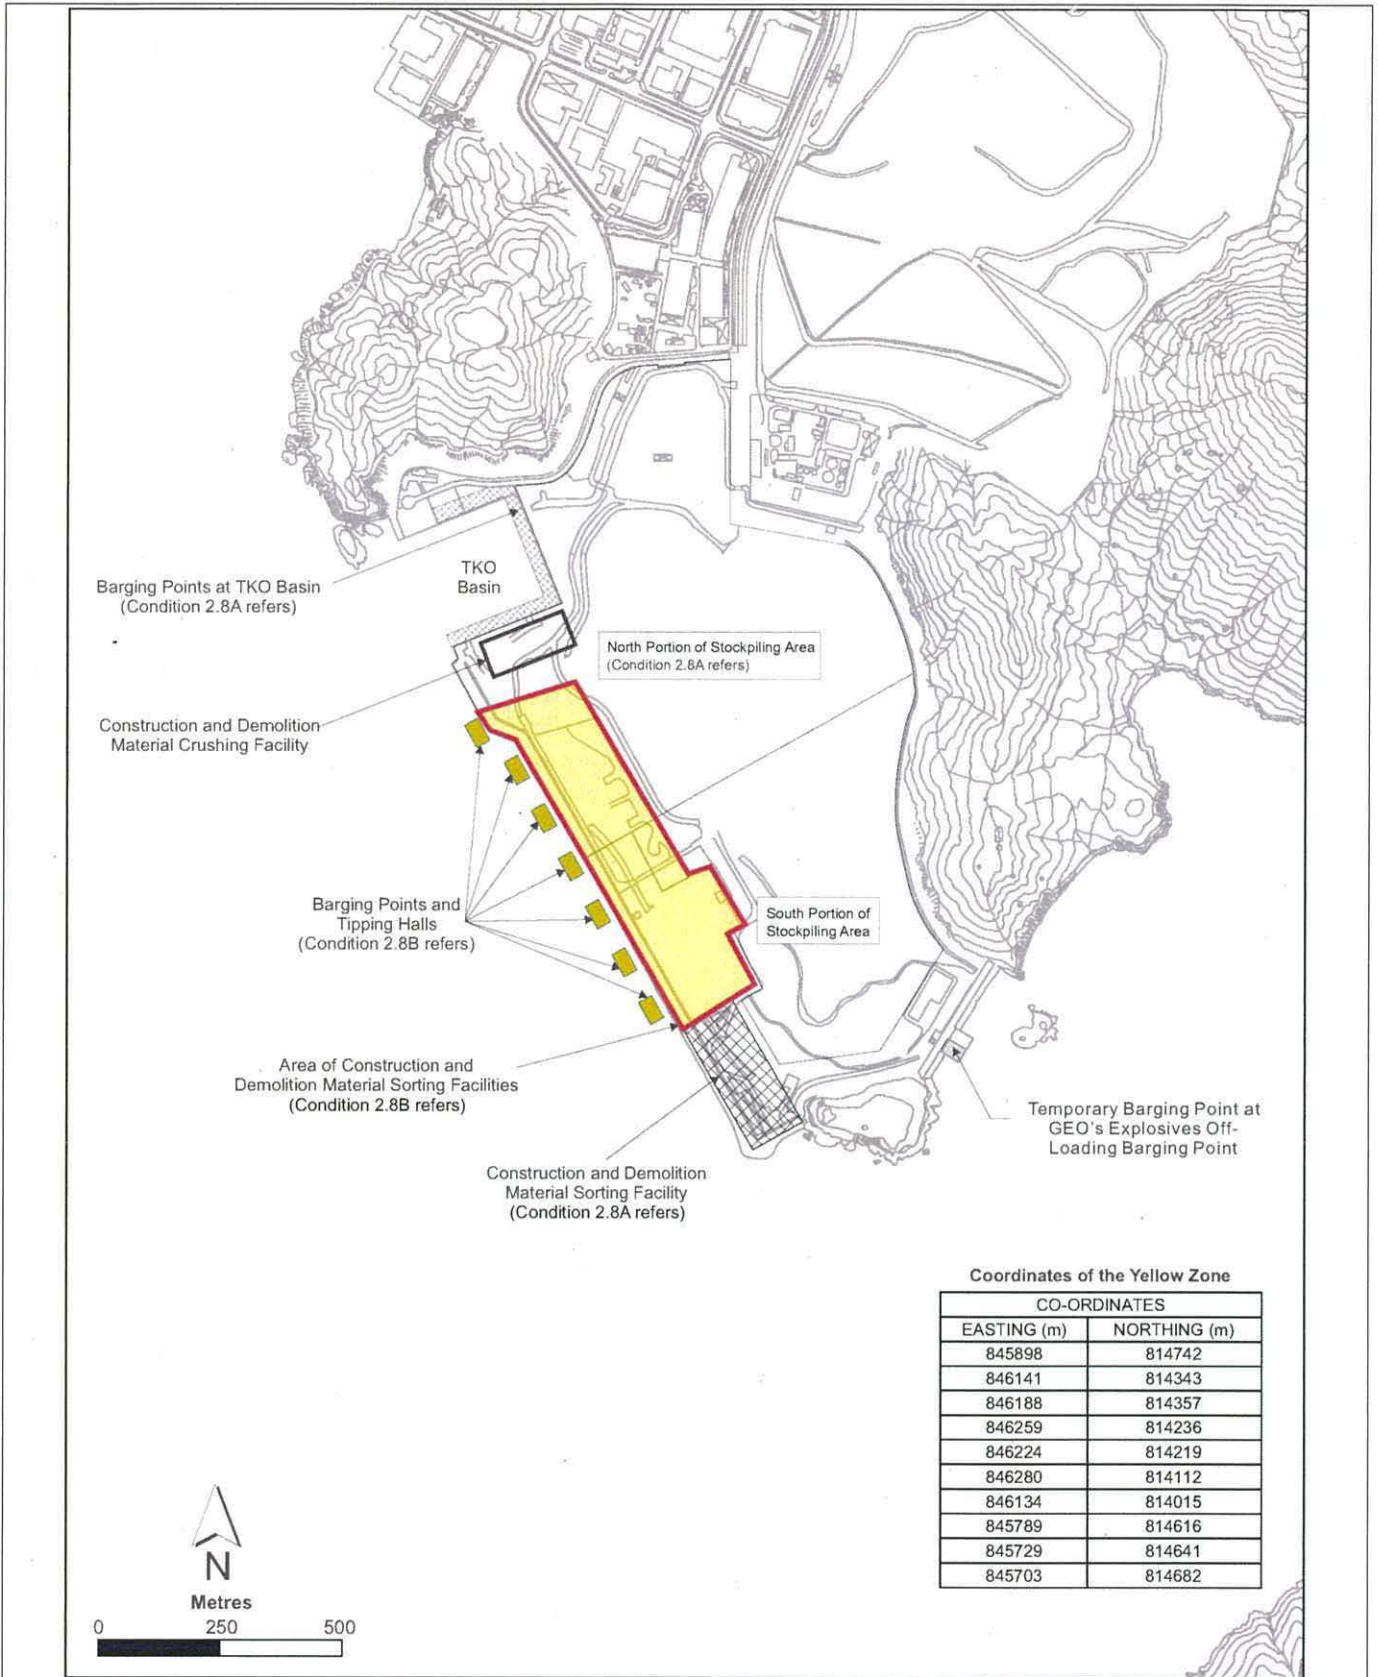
Locations of Facilities within Tseung Kwan O Fill Bank
